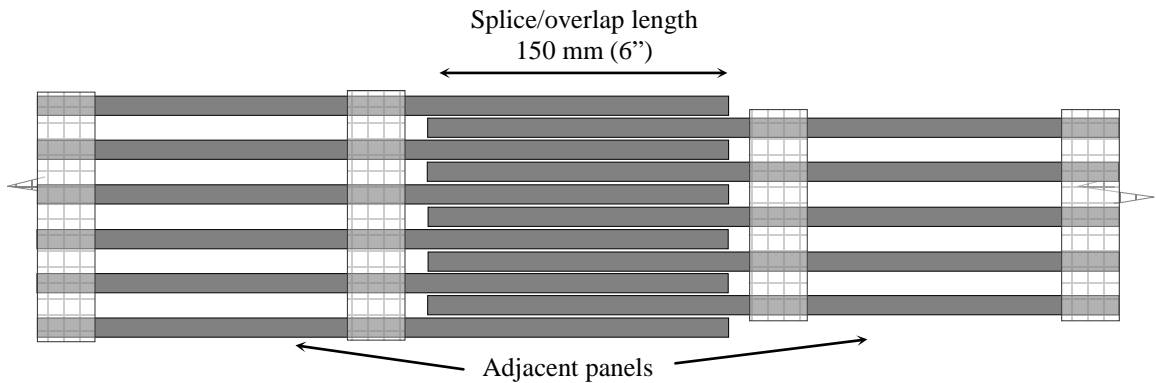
Adjoining strip panels with ‘finger’ joint
